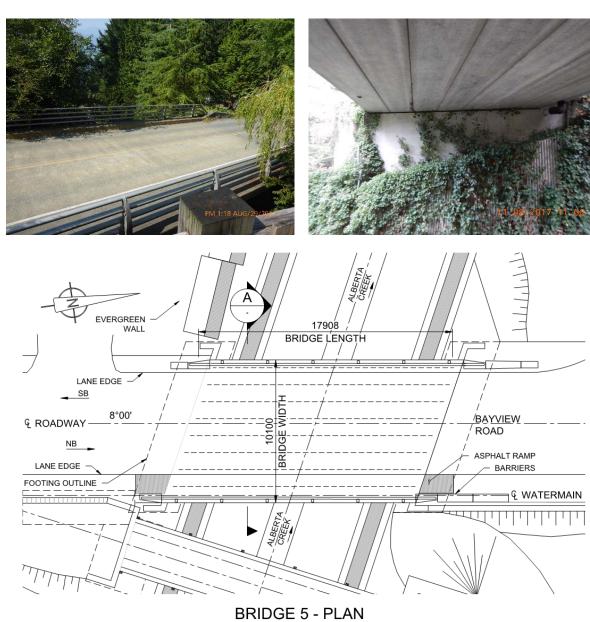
Bayview Road Bridge over Alberta Creek - Plan
